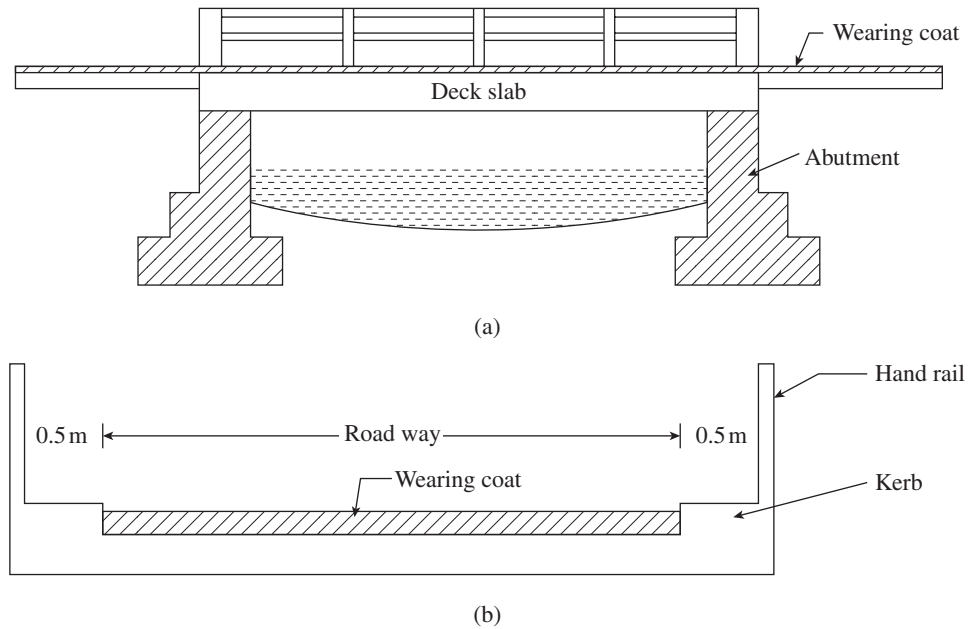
Typical culvert (a) Longitudinal section (b) Cross section
